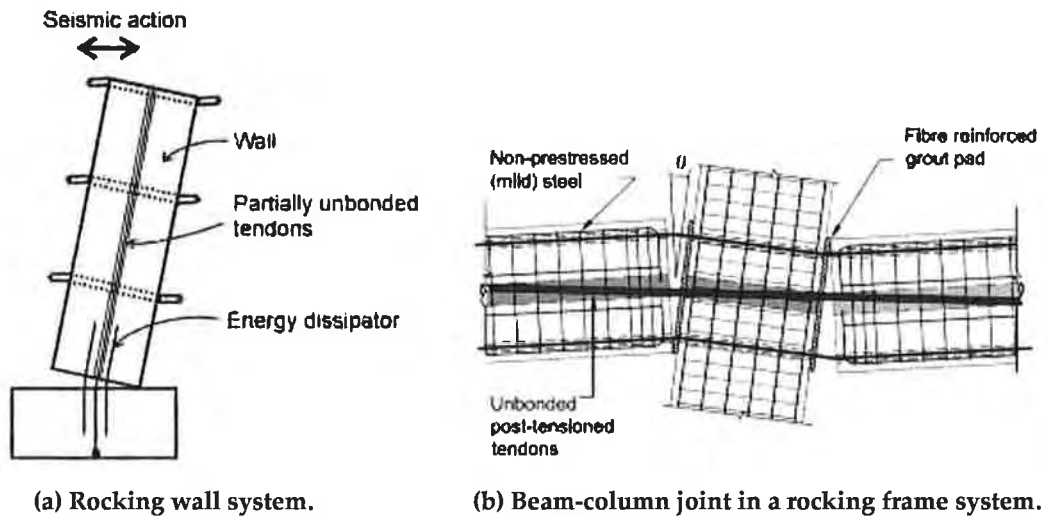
Rocking hybrid frame or wall system (after fib, 2003).
